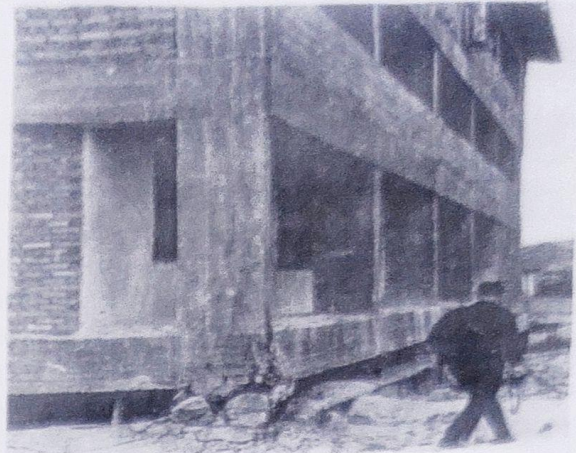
A close-up showing shattered columns, and some cracking of brick interior columns in the basement were free to deflect over their entire height whereas the exterior columns were greatly restrained by the heavy basement wall.
